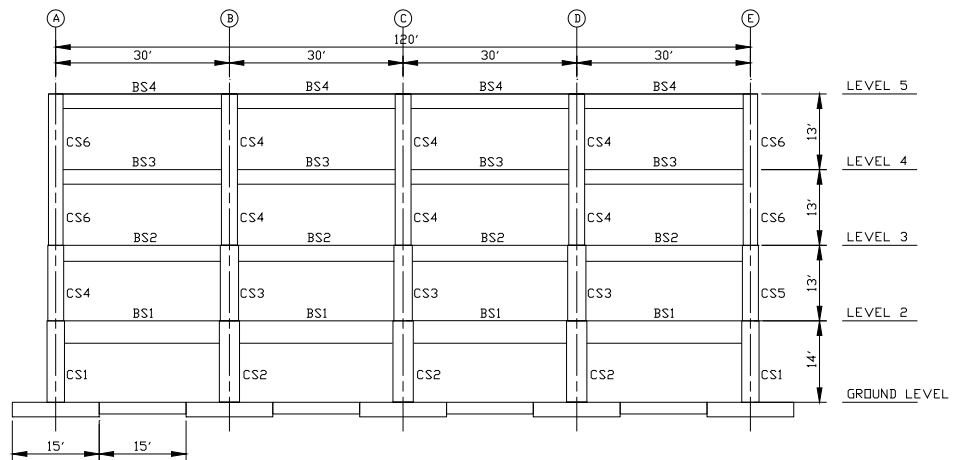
Elevation view of one frame of Benchmark building (from Haselton et al. 2008).
